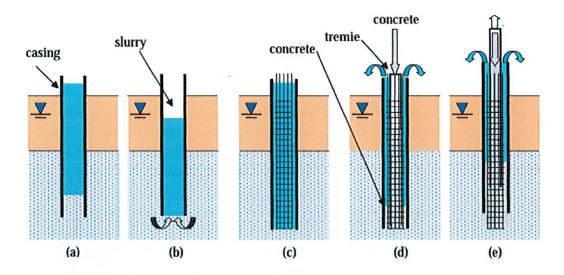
3: Wet Hole Construction Using Full Length Casing: (a) advance casing and excavating, while maintaining soil plug within casing through caving soils; (b) bottom instability due to inadequate slurry level and/or soil plug at base in caving soils; (c) complete and clean excavation, set reinforcing; (d) place concrete through tremie; (e) pull tremie, casing while adding concrete (Source: AASHTO LRFD Bridge Design Specifications, 4th Edition)
